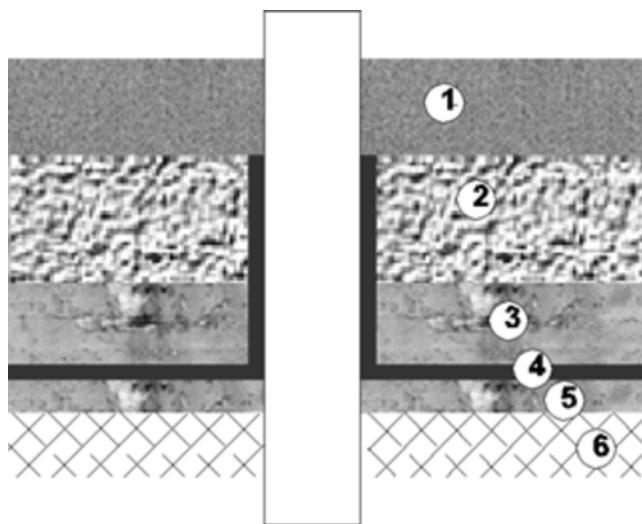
Layers of experimental parking lot pavement, 1 – slag pavement ~20 cm, 2 – ash-phosphogypsum base ~25 cm, 3 – filtration layer of sand ~10–15 cm, 4 – waterproofing membrane (road type), 5 – sand bed -5 cm, 6 – soil subgrade
